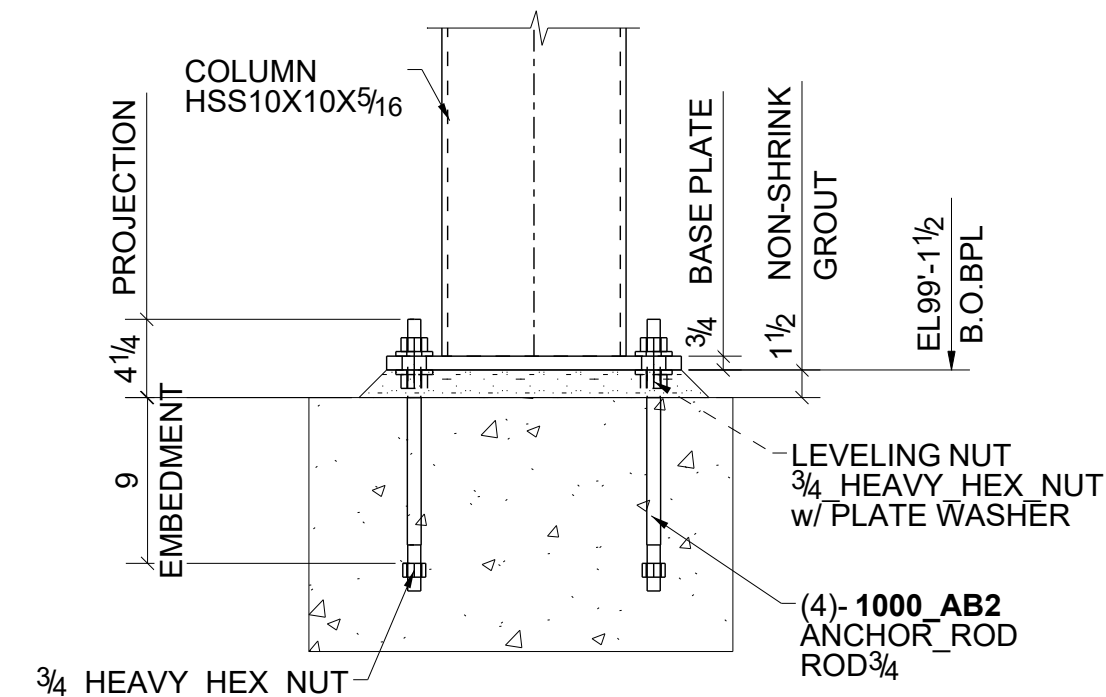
DETAILS OF : PARTIAL ANCHOR BOLT PLAN FOR AREA B REF. DWG. NO : S1.01B
